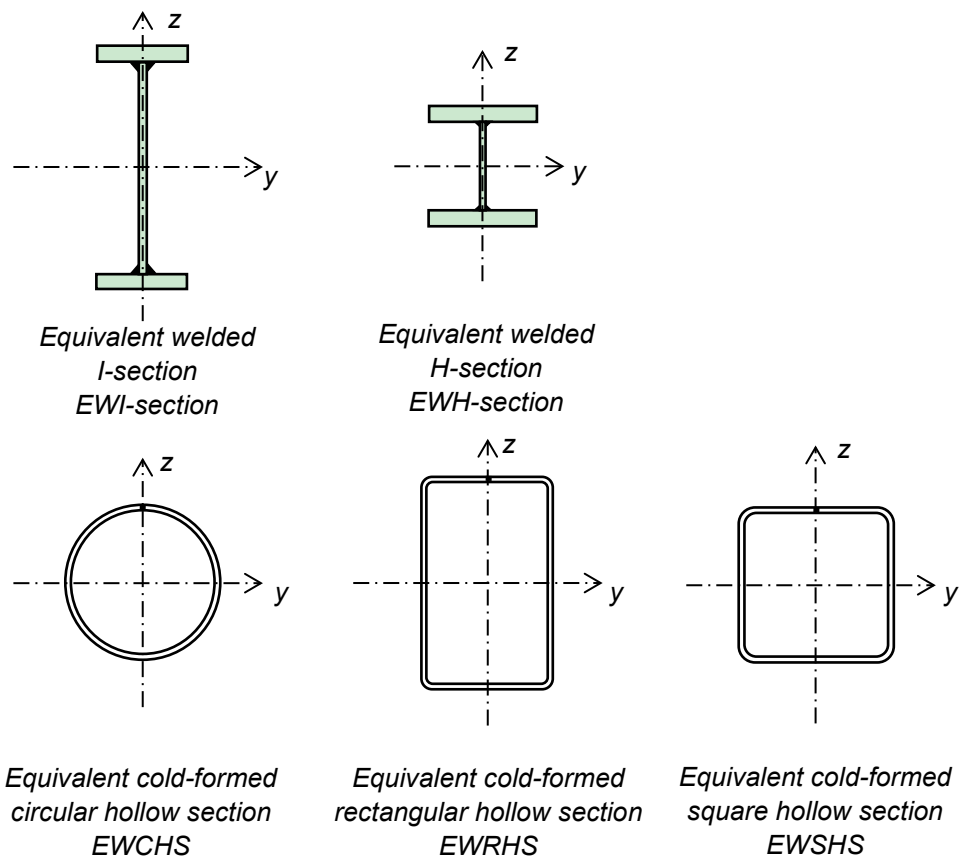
Cross-sections of typical rolled and welded sections
